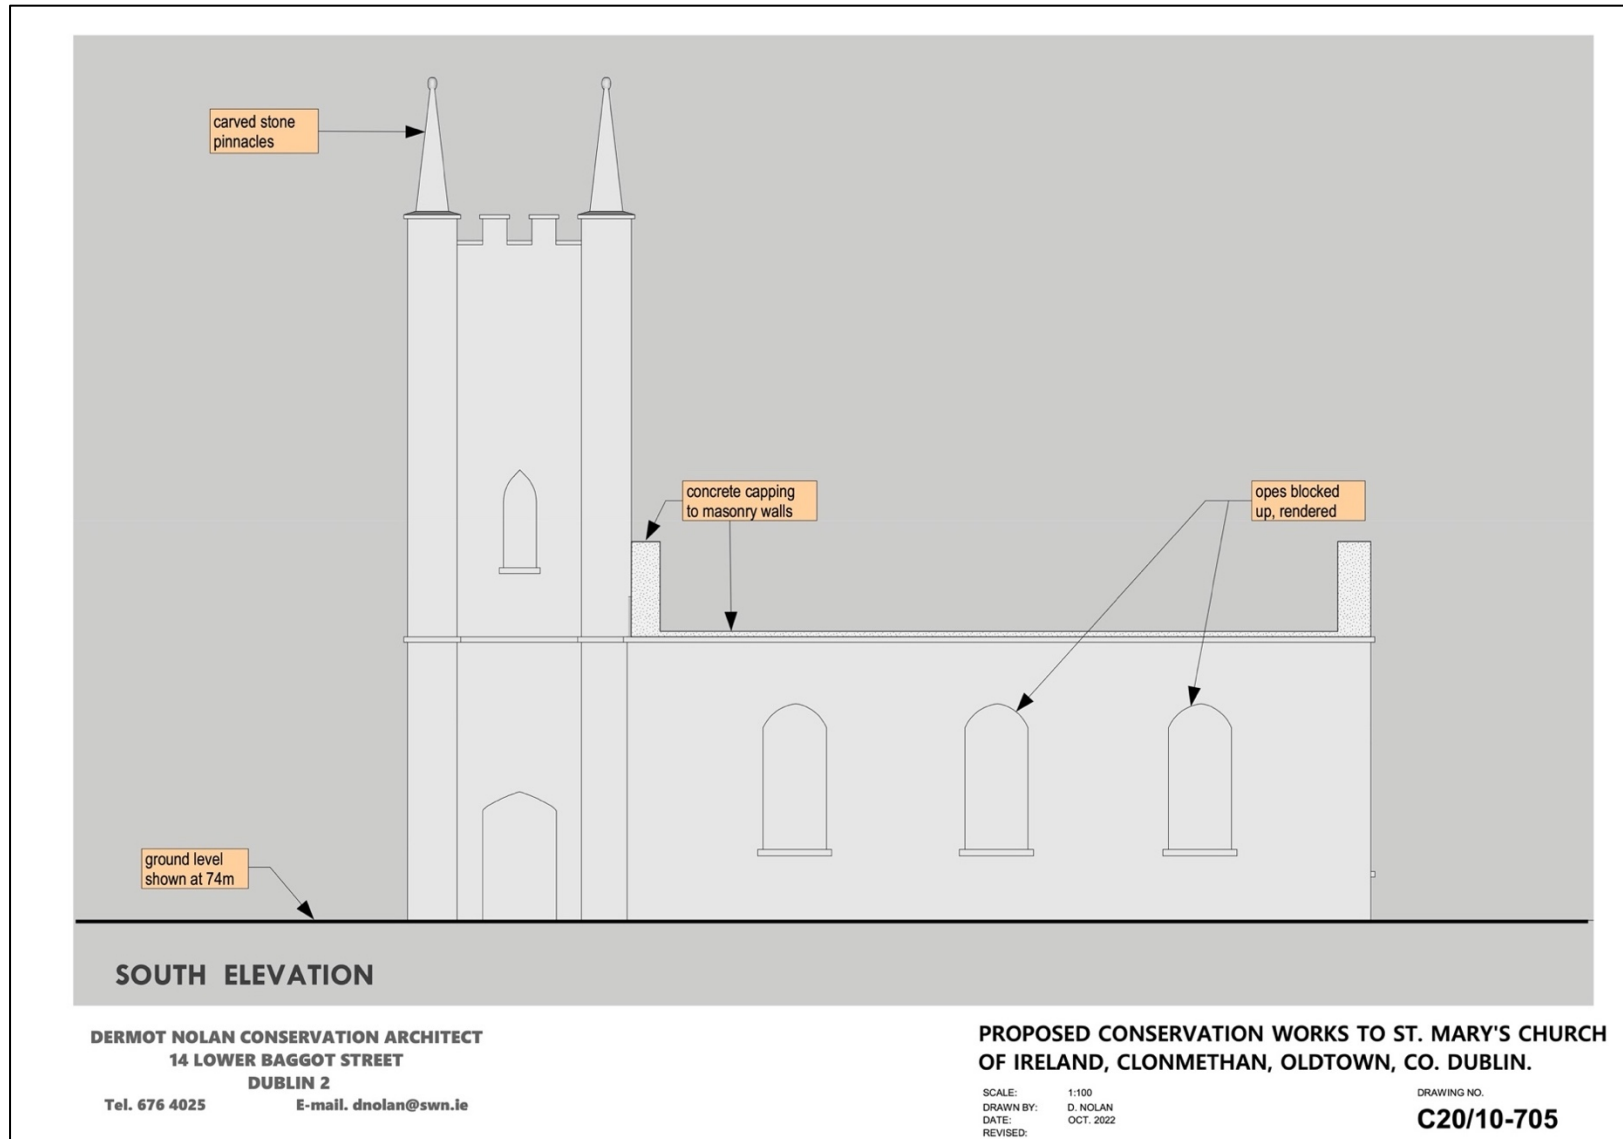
Condition of south elevation of St Mary's Church (drawing produced by Conservation Architect for the CMP).
